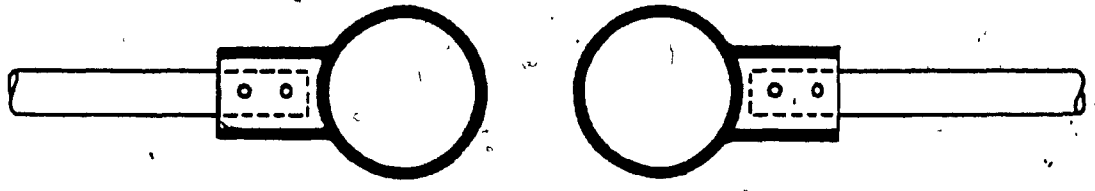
SECTION OF A TYPICAL CONNECTION BETWEEN A STIFFENER OR BRACING TRUSS MEMBER AND A RING MEMBER.
